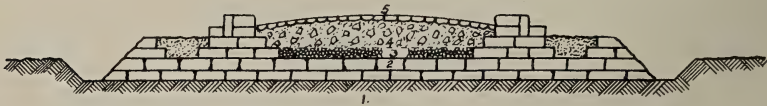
Cross-section of The Appian Way—1, Solid subsoil; 2, Flat stone laid in mortar; 3, Well beaten Rubble; 4, Gravel or broken stone and lime; 5, Stone blocks fitted into place
